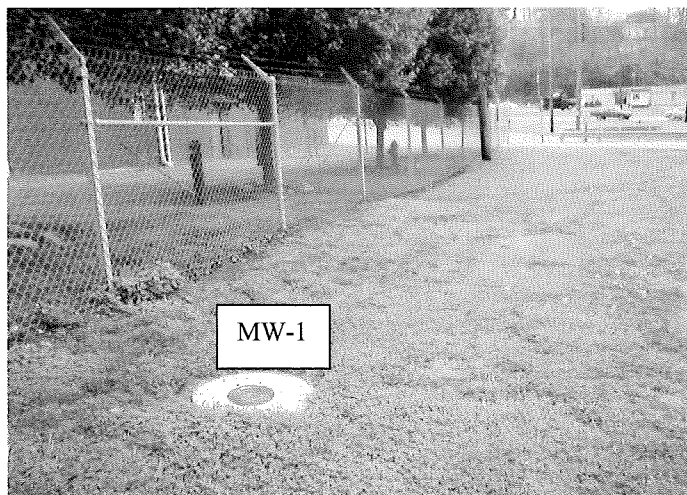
Looking west along the proposed drainage piping area within the proposed NCDOT right-of-way.
